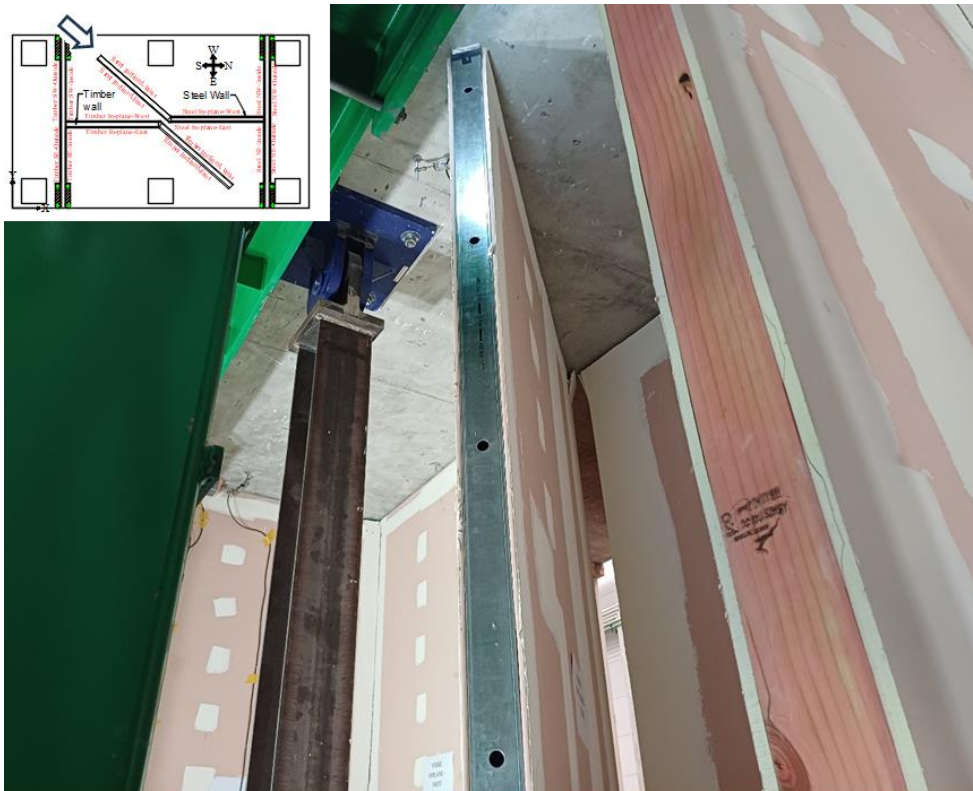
Walls elevation from South-West direction after motion 18 - 3 % inter-storey drift
